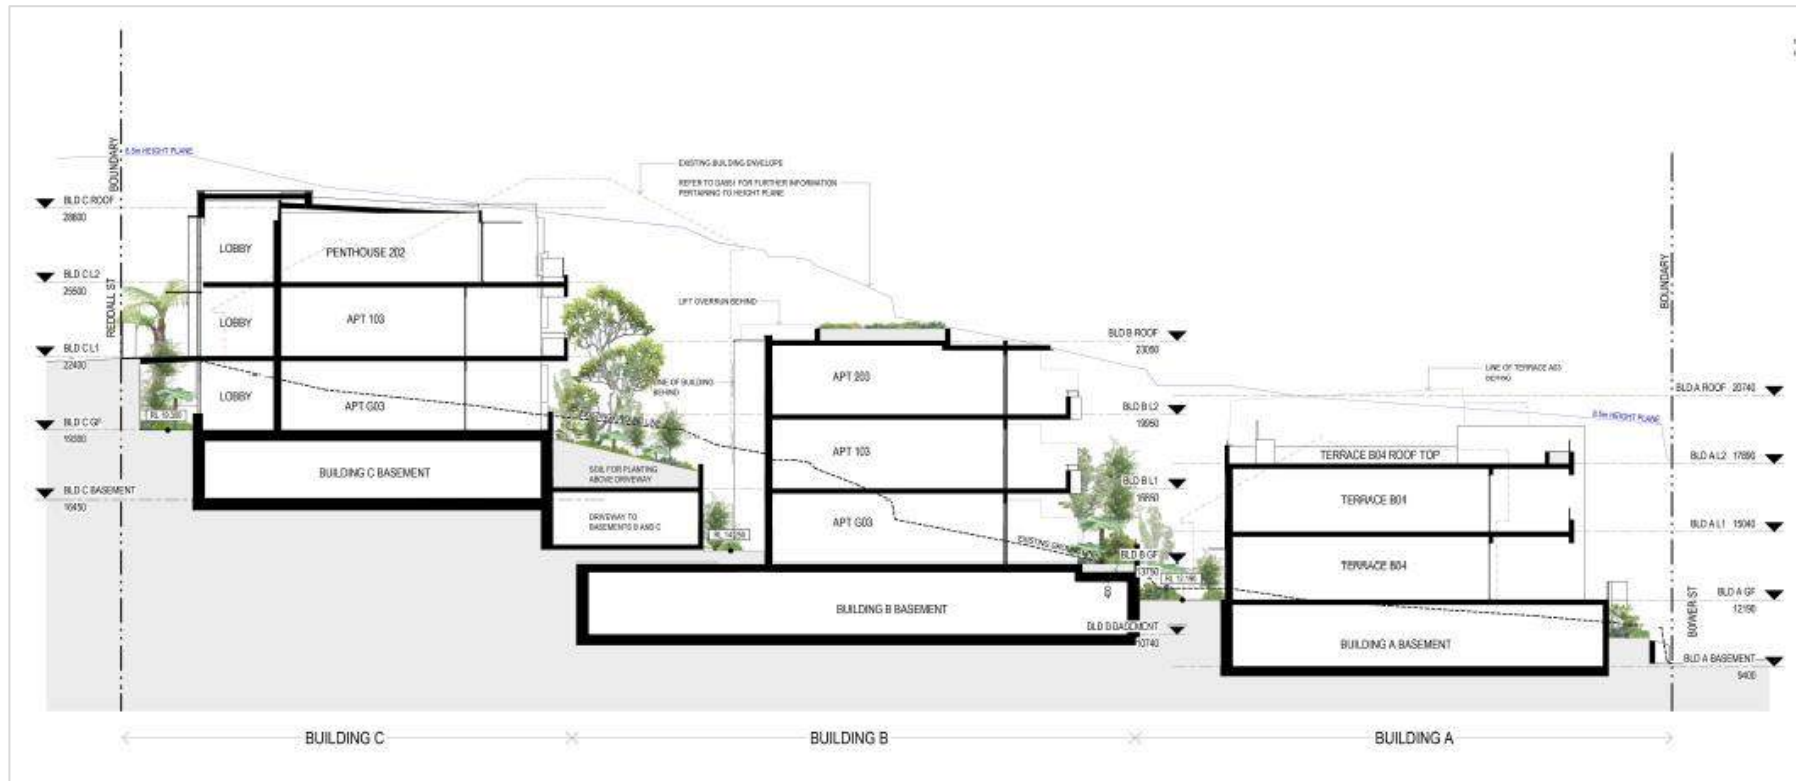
Section Plan A showing the 8.5m height limit in light blue and the portions above the height limit viewed from College Street (Source: Squillace Architects)
